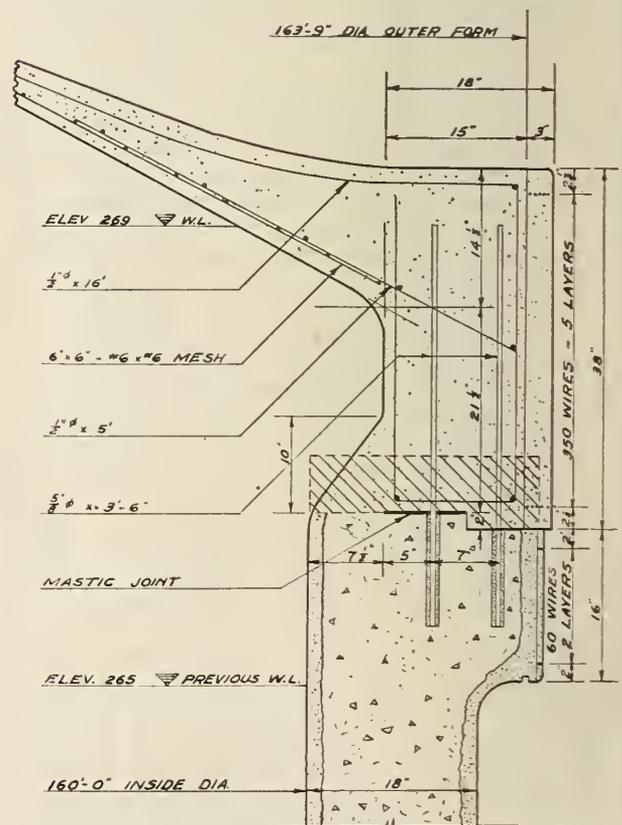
Design sketch of prestressed ring and seating on old wall.
